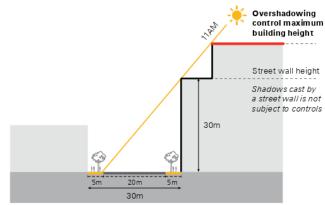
Section A: Wellington Road 20m north/south street demonstrating no additional overshadowing above the street wall height between 11am and 2pm on 22 September.
